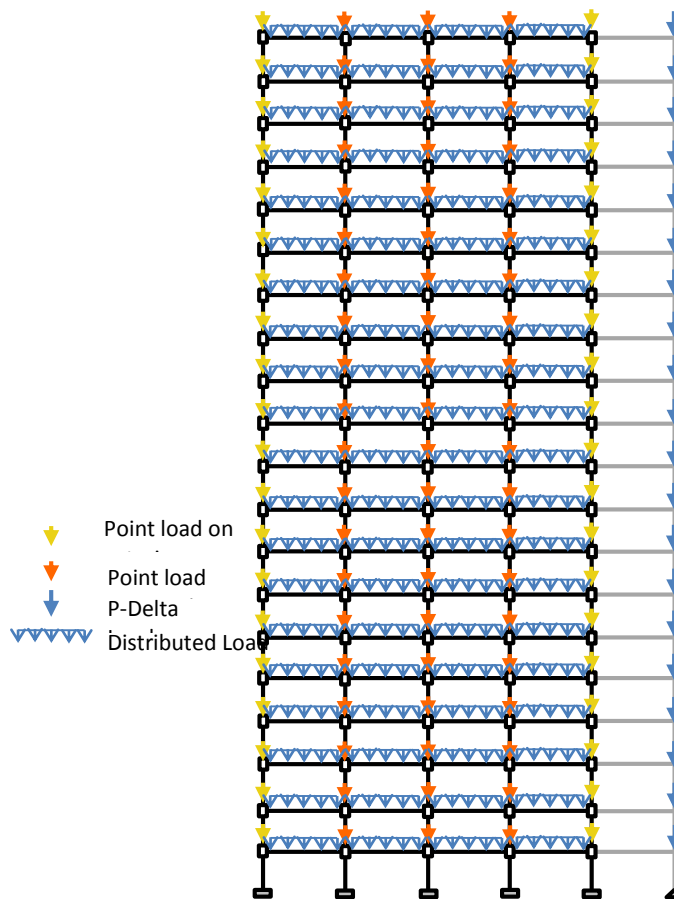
Illustration of the implemented gravity and P-Delta forces on N-S Frame Elevation
